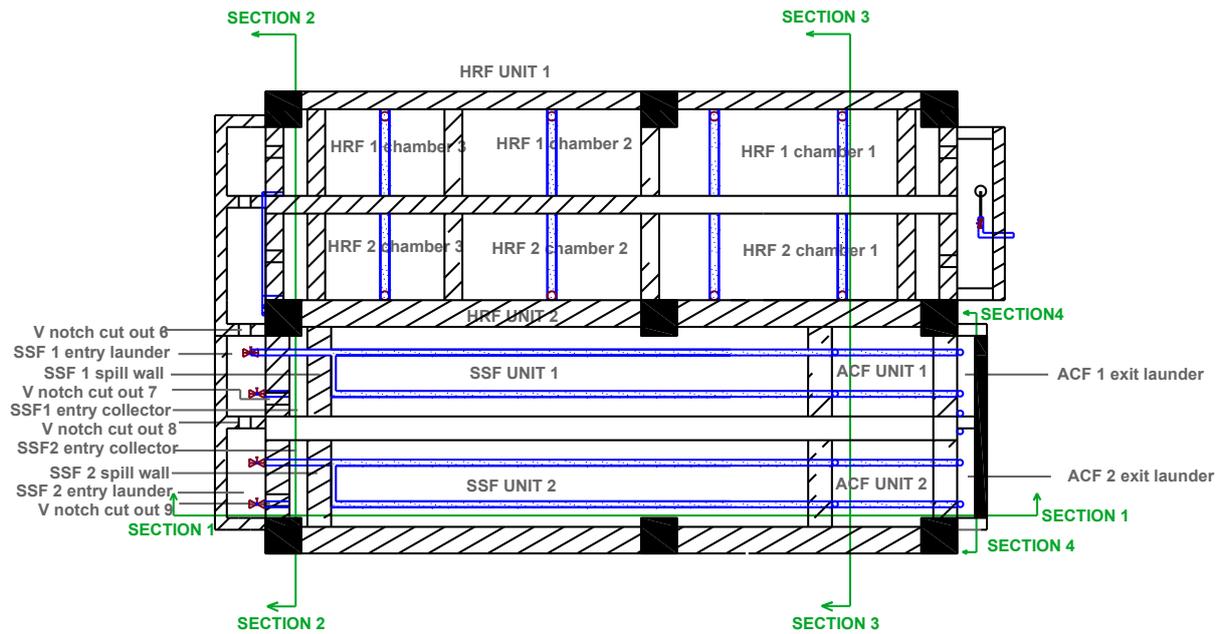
Plan view of the SSF and ACF units indicating the position of the entry launder, v-notch, entry collector and spill wall
